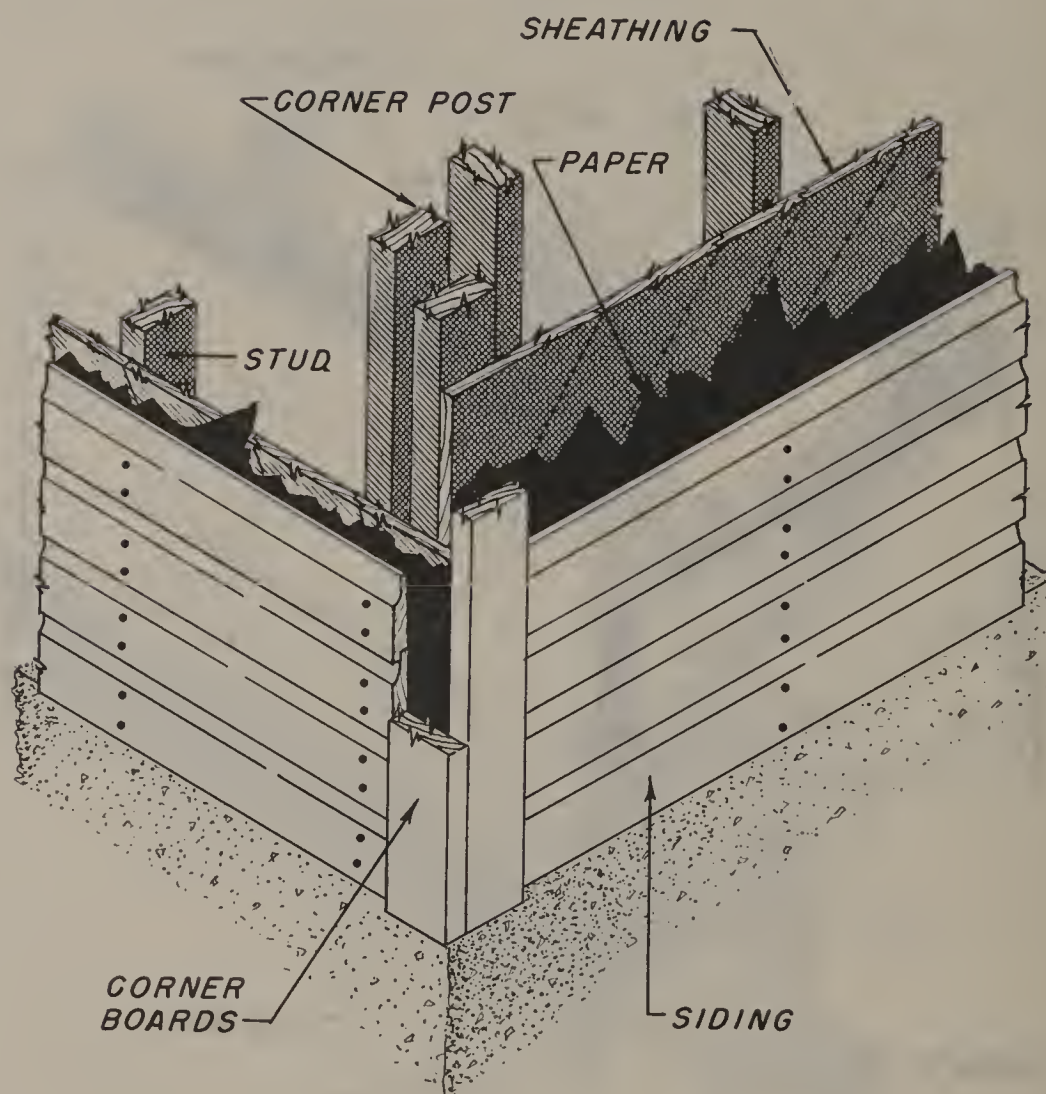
Drop siding. Face-nailed to each stud with two nine-penny casing nails, one near lower edge and one above midheight of piece of siding. Note: As shown, ends of the drop siding are fitted against the corner boards. A common practice is to end the drop siding approximately at the corner of the frame and place the corner boards outside the siding. This leaves spaces between the corner boards and the siding into which water may be blown to cause a decay hazard.
